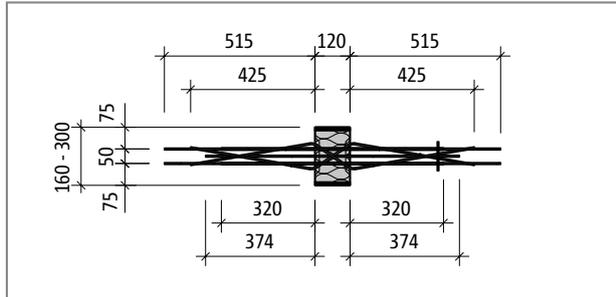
Schöck Isokorb® XT type W-M1: Product plan view
